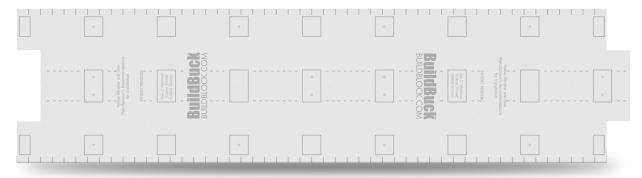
BuildBuck top face with attachment points, cut lines, and inspection port markings.
